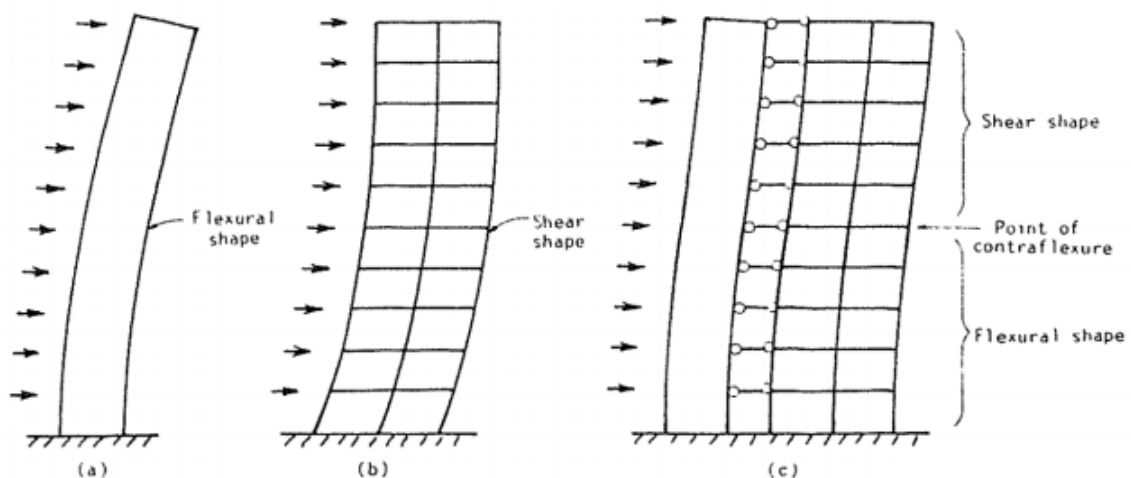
Illustration of deformation shapes of a tall building due to lateral load (Stafford Smith & Coull, 1991). a) Bending deformation, b) Shear deformation and c) combined deformation
